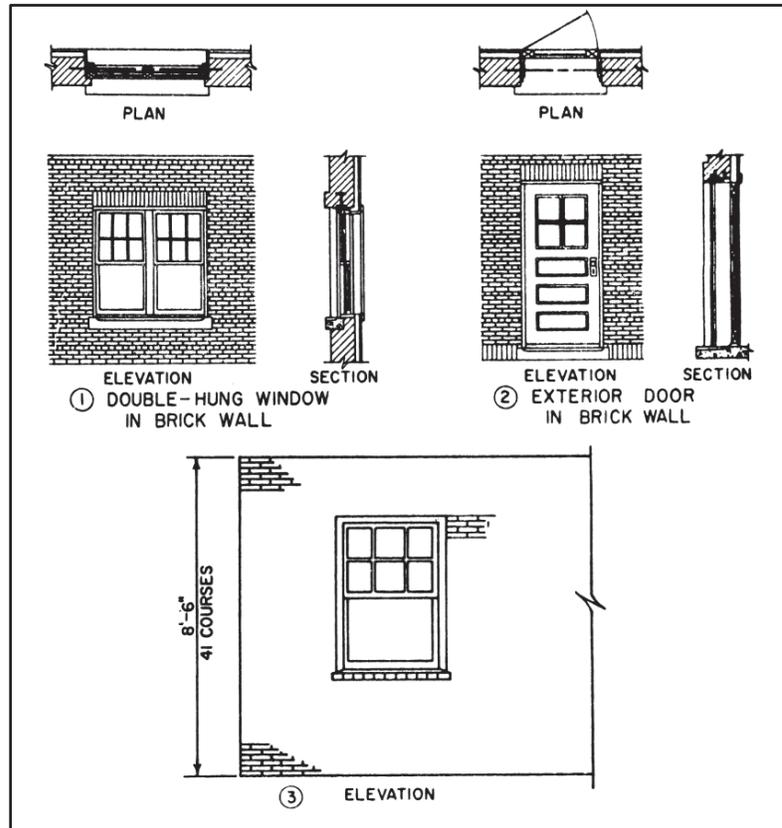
Typical brick masonry structure in plan, elevation and section
